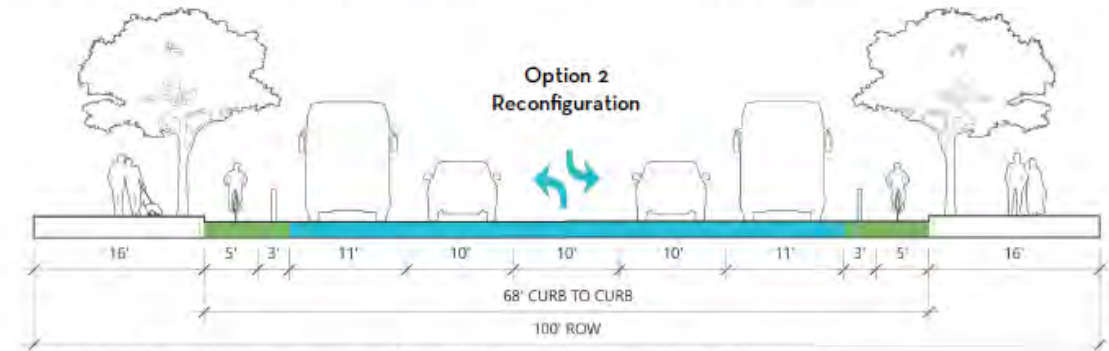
Option 2, one-way, on-street class IV bikeway, if on-street parking is removed.
